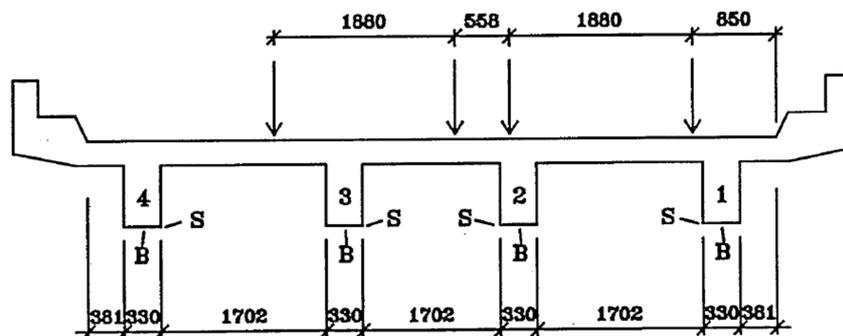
Static truck load position 2 <sup>[46]</sup>
